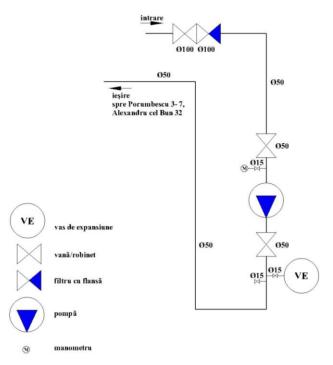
Hydraulic Scheme with existing equipment of BPS-9 – Porumbescu 3
